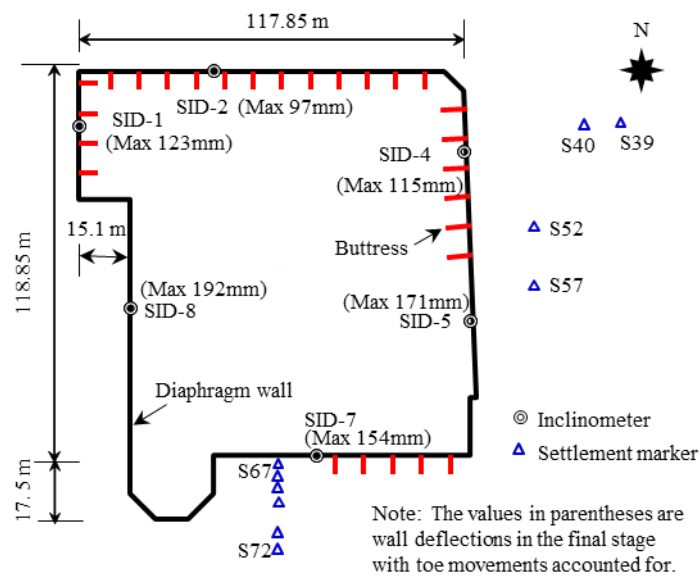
Layout of diaphragm wall and buttress wall (after Hwang et al. 2007)
